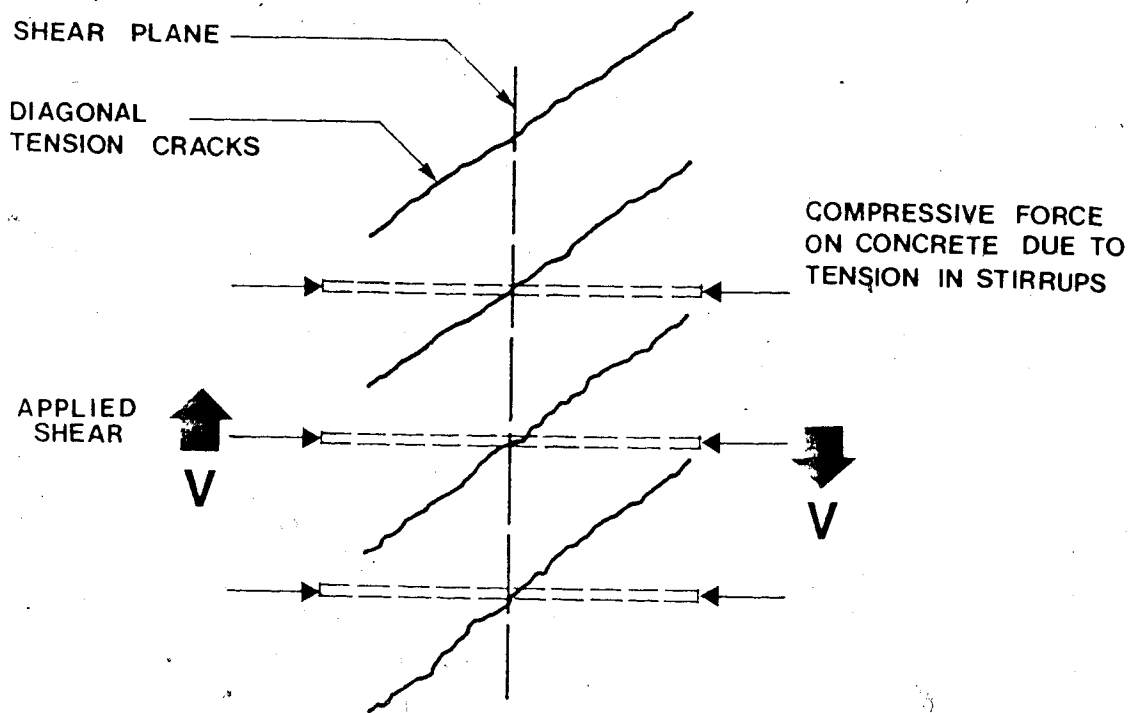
"Truss" Formed After Diagonal Tension Cracking
